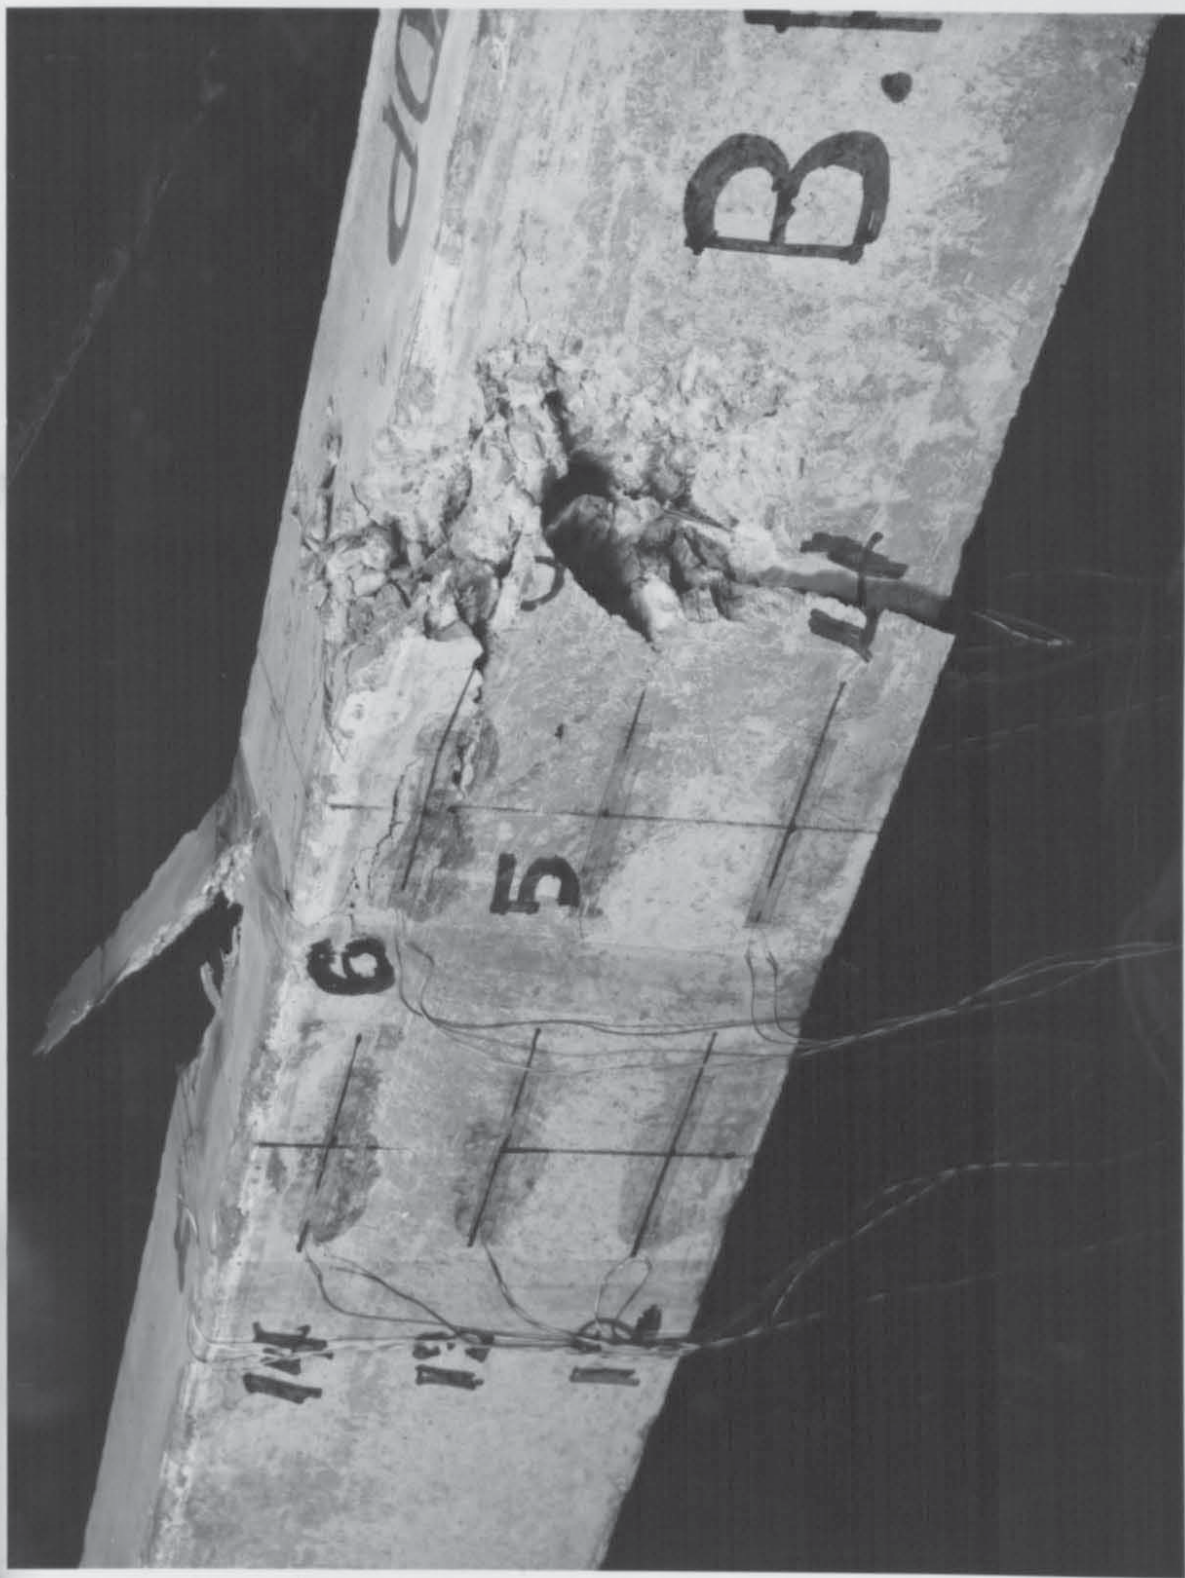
FAILURE CRACKING PATTERN OF BEAM B-6 A BACK FACE-TOP VIEW
